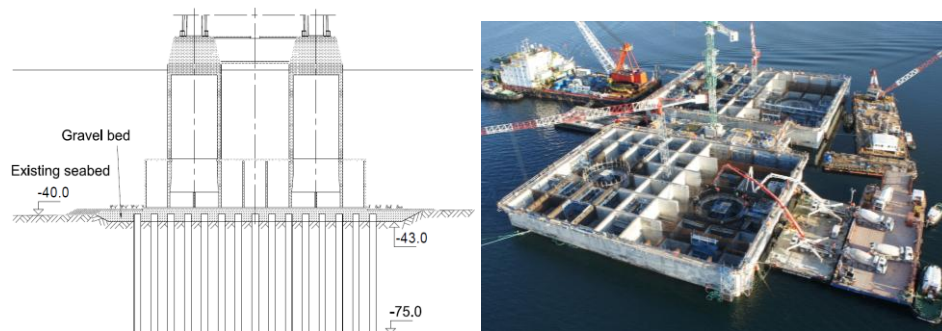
(a) Section through tower foundation; (b) float out from dry to wet dock of caisson
